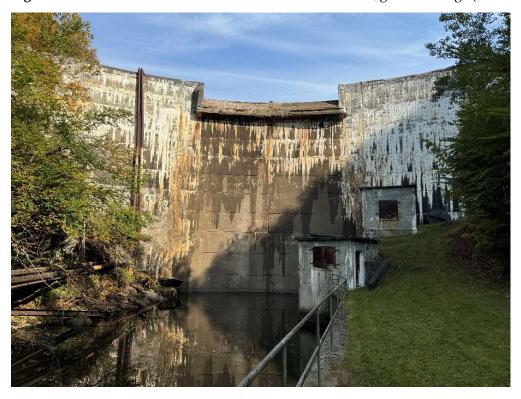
Upstream side of powerhouse, stair access and entrance (11-21-2023).
